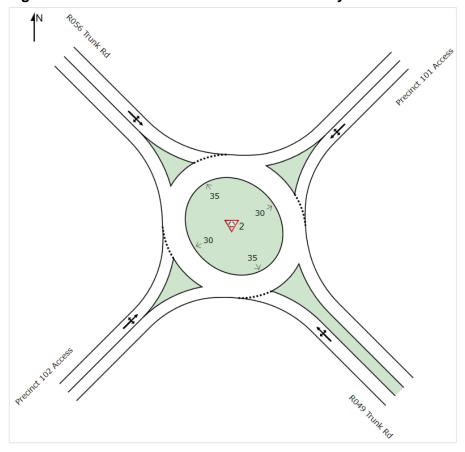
Intersection 2 SIDRA Intersection Layout
